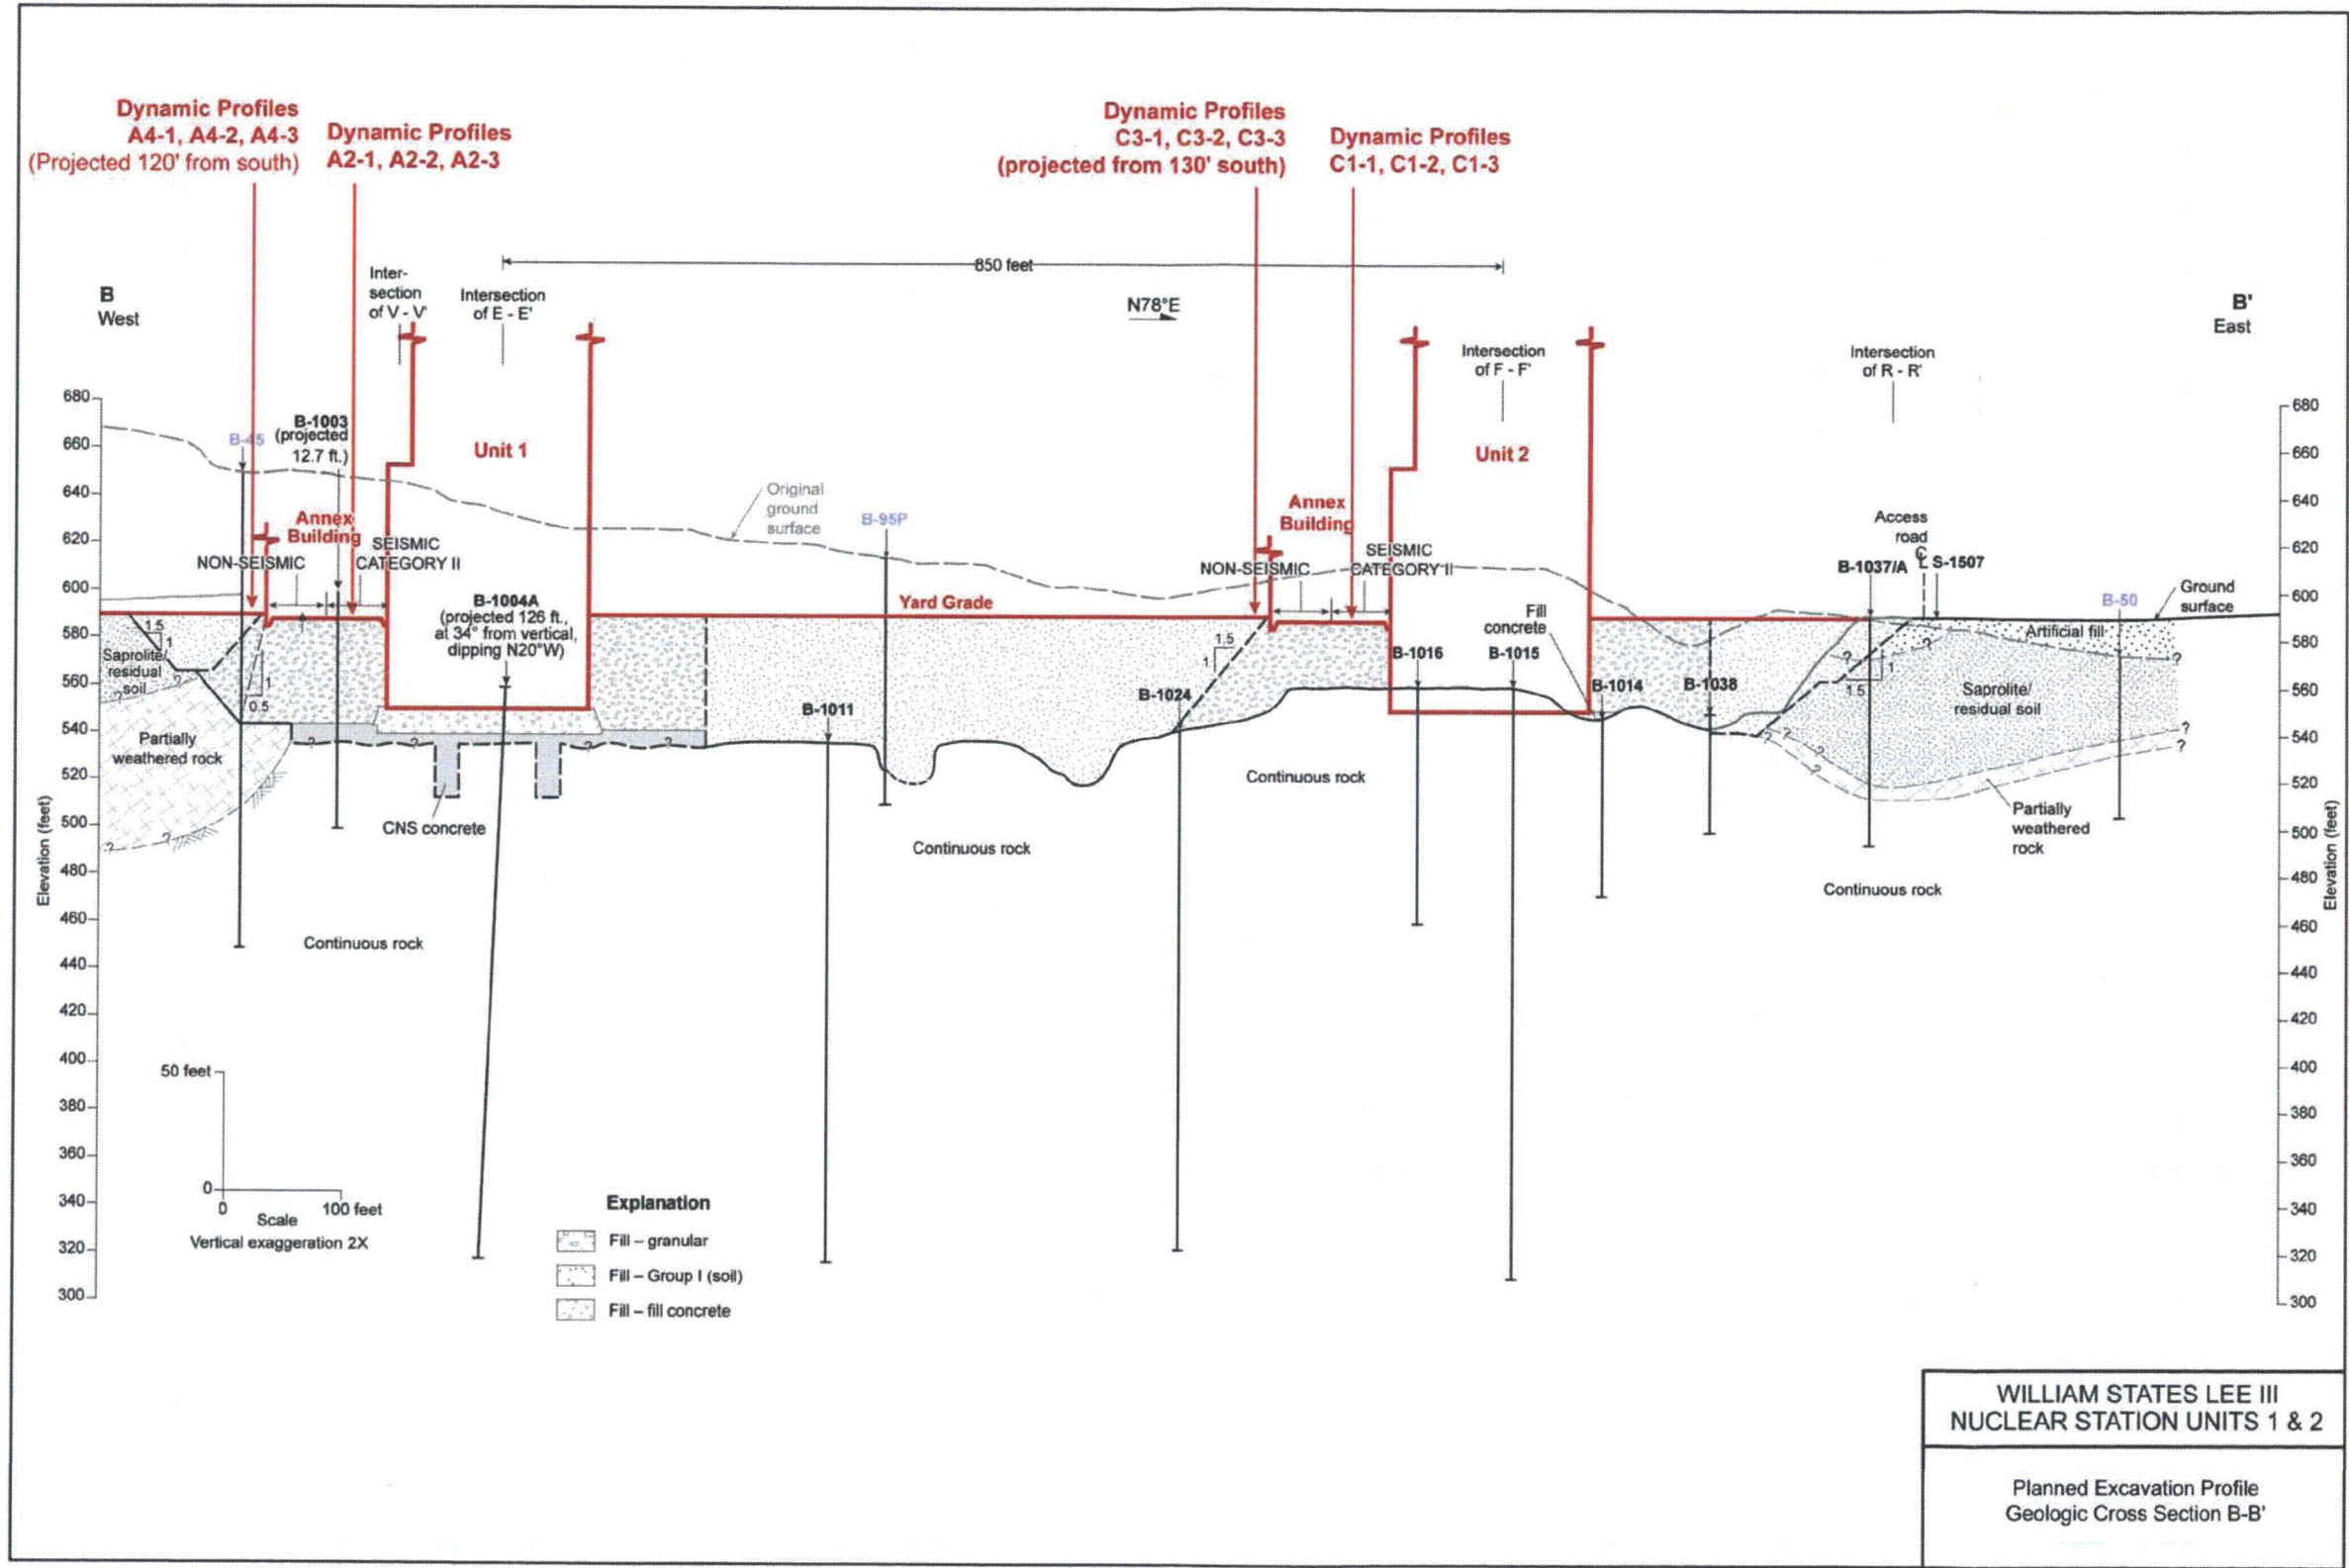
Planned Excavation Profile Geologic Cross Section B-B'
